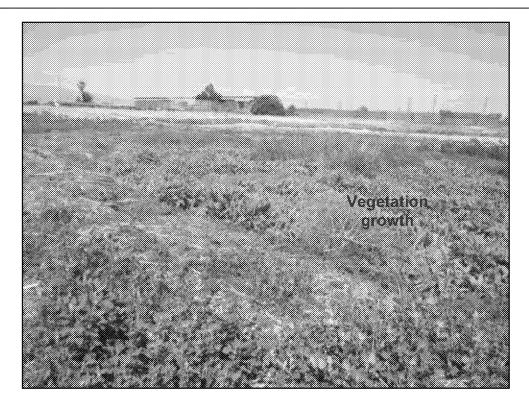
View facing northwest of evaporation pond No. 1 located in the northwest portion of the Facility.
